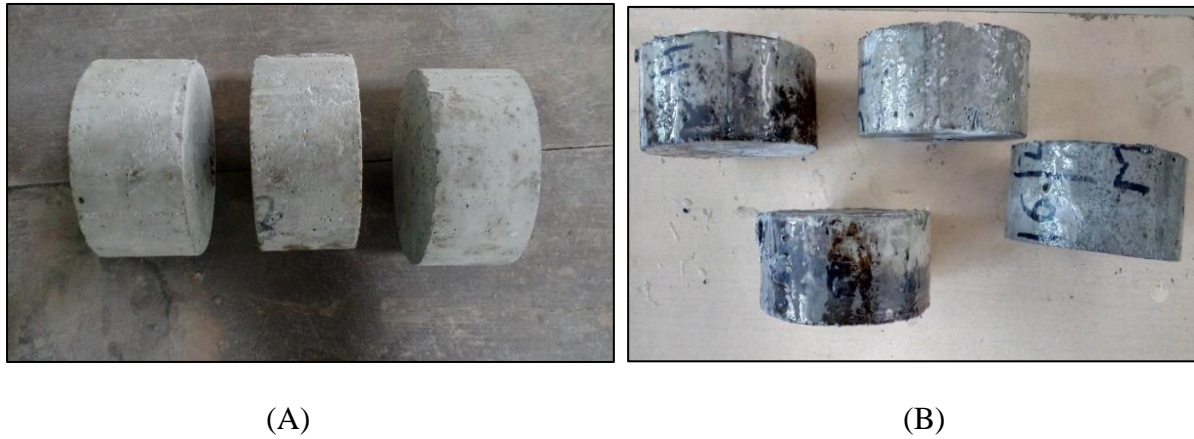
13: (A) 50 mm cylindrical slice of 100 mm diameter (B) Epoxy coated specimens.
